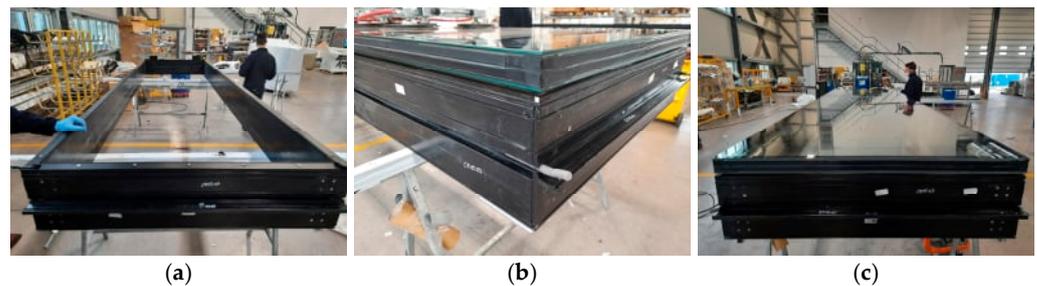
Vision façade module prototype manufacturing: biocomposite profile frame and aluminum plate assembly (a); glass detail (b); glass on the biocomposite profile frame before the sealing (c).
